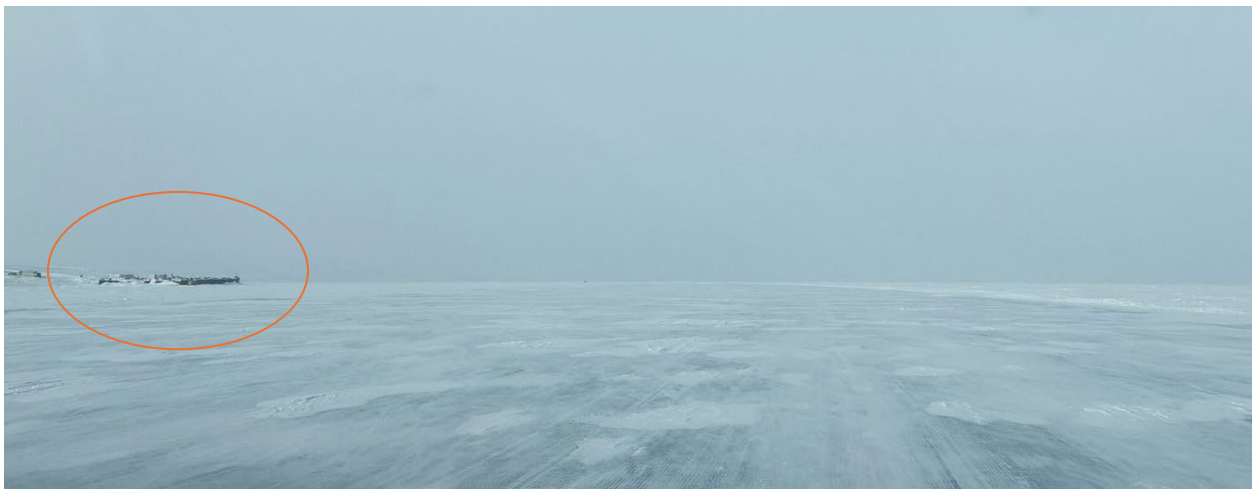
Sea-ice section of the road with the MLA cargo offload area located on the left; northbound view
